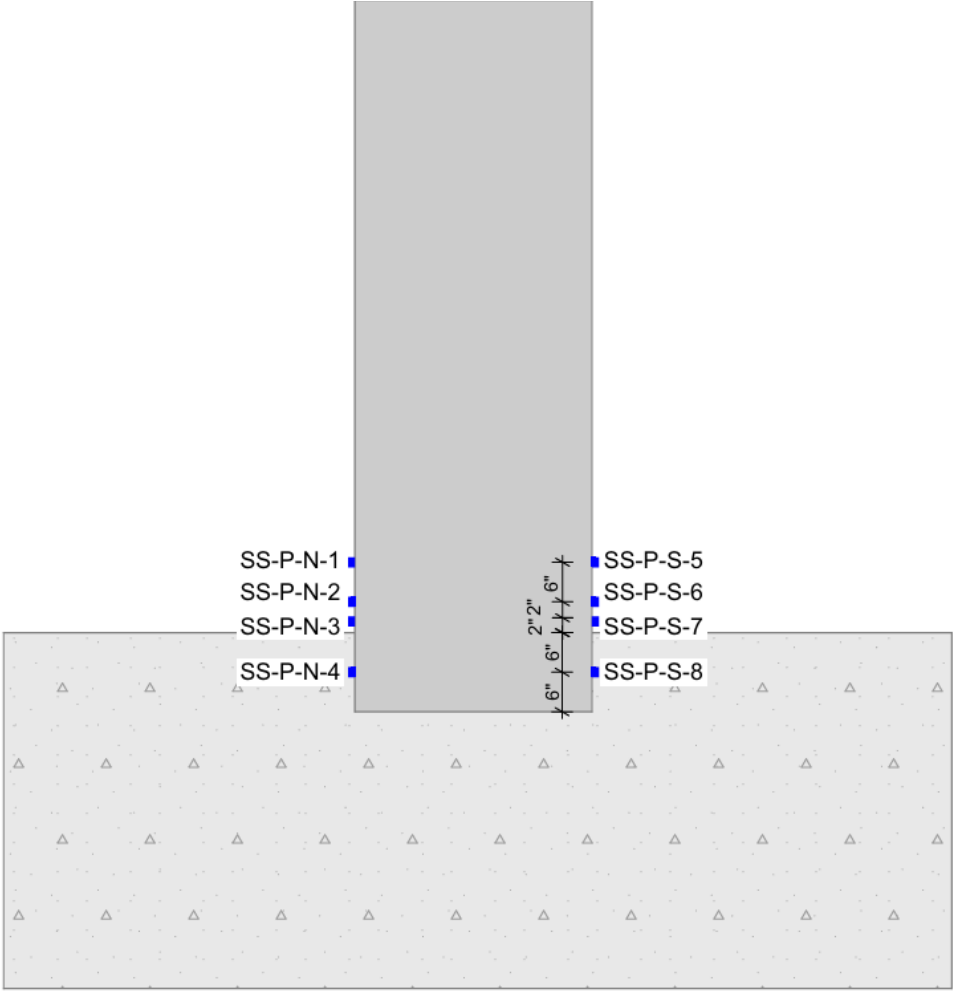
Strain gauge layout for 9 ft steel pipe pile in reinforcing steel connections
